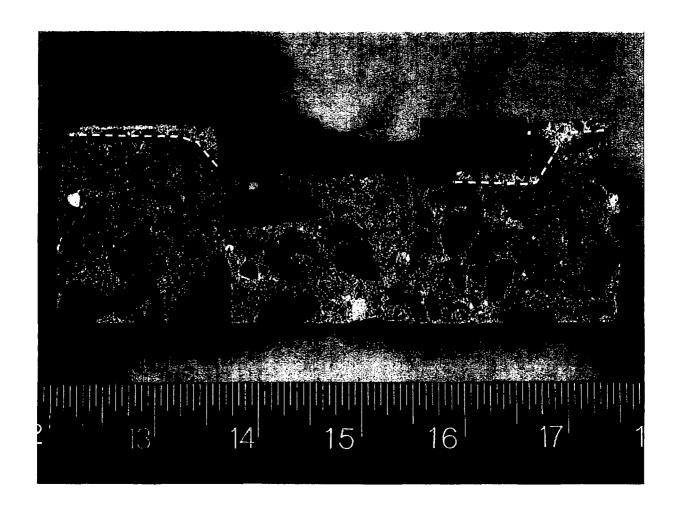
Cross-section view of Core 124, Section 1 (lapped surface). The dashed yellow line shows the area of the degraded cement paste. Two vertically oriented parallel cracks are shown by the arrows.
